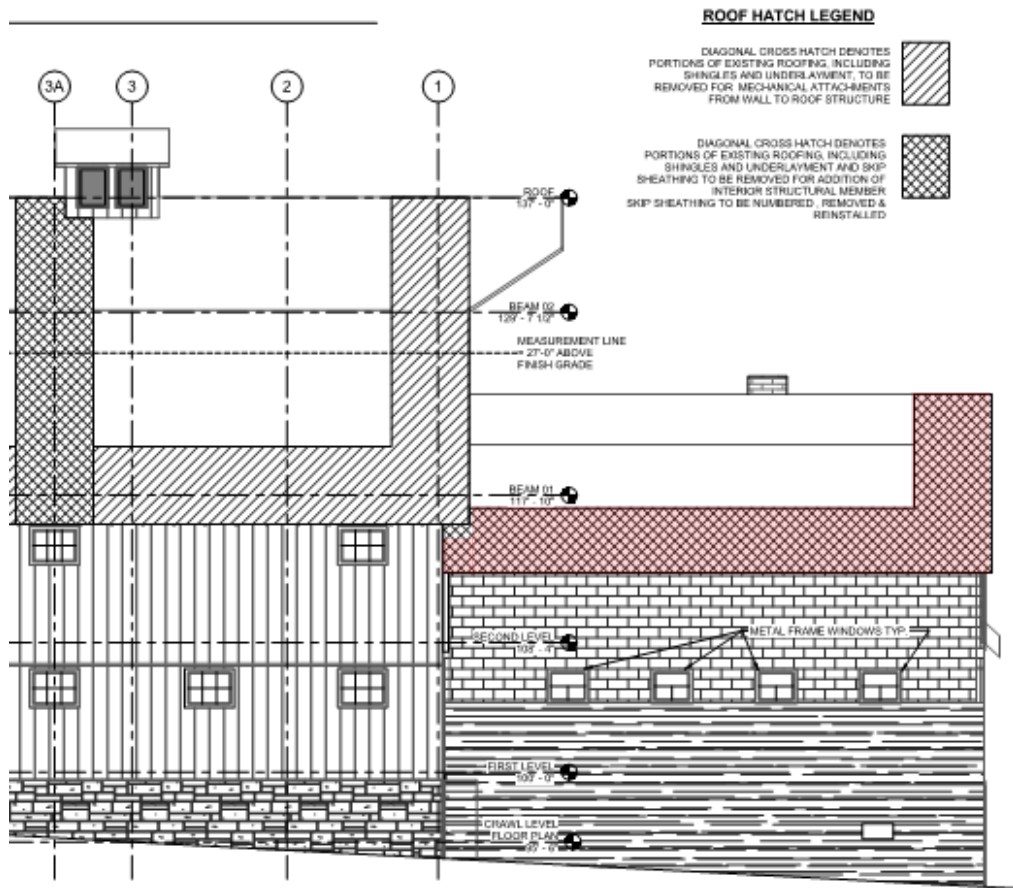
ca. ca. 1930s Milk House Addition Gable Roof Sections to be removed. The same material will be removed on the north elevation of the roof (shaded red). 1930 Milk House Addition South Elevation.
